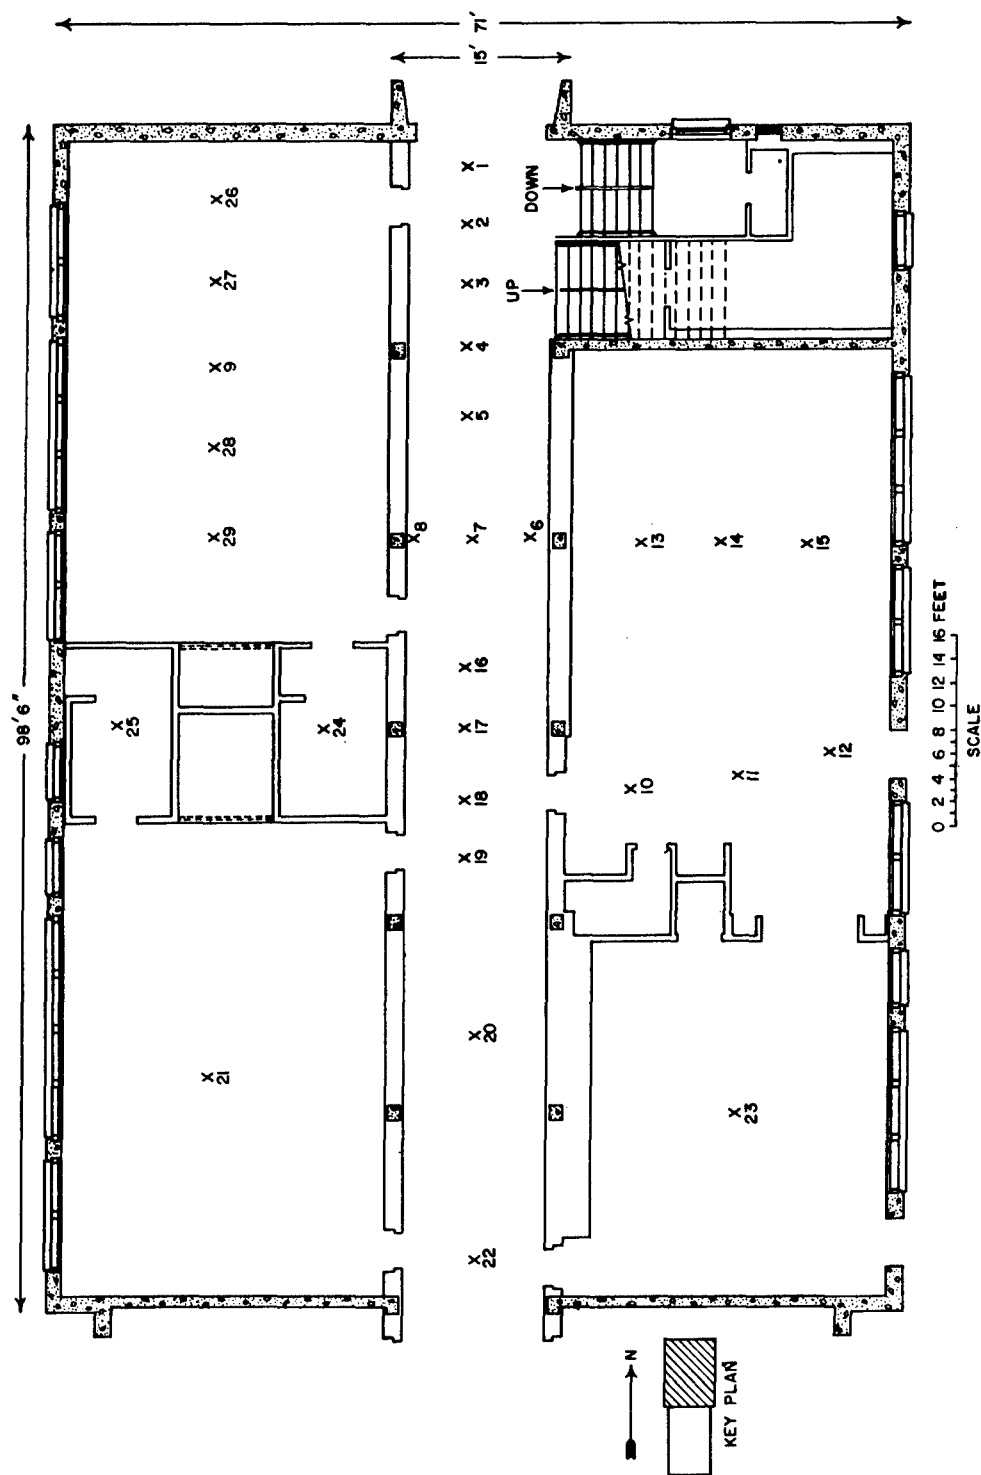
First-floor plan of North Hollywood High School classroom structure showing detector positions.
